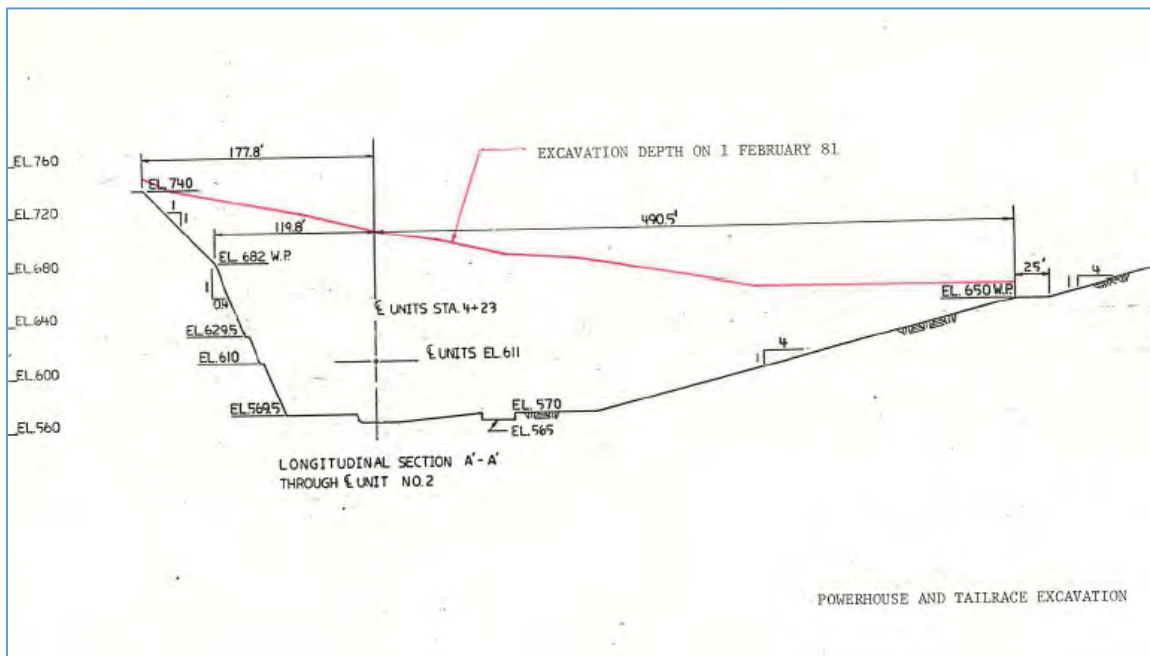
Elevation of Powerhouse and Tailrace Excavation progress in 1981 (Source: GPC 1981).
